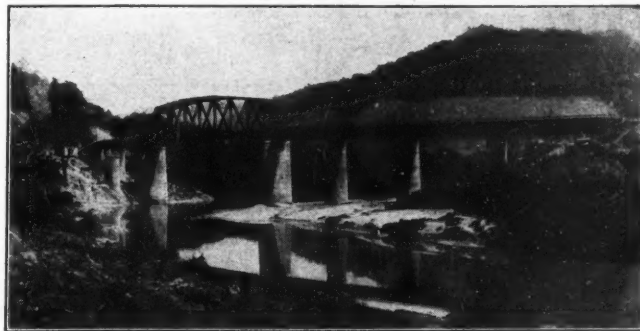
RAILROAD BRIDGE CONSTRUCTED TO MINE
